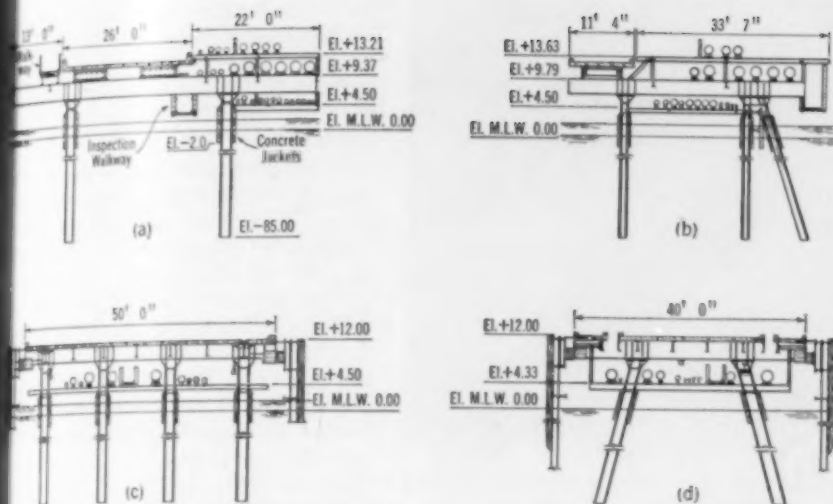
TYPICAL SECTIONS indicate design of all-welded steel piers to carry 35 pipelines for petroleum products, ballast and service lines: (a) Approach trestle, (b) pierhead trestle, (c) finger pier No. 2, (d) finger piers Nos. 3 and 4. Spring-fender system protects piers and turning dolphins.
